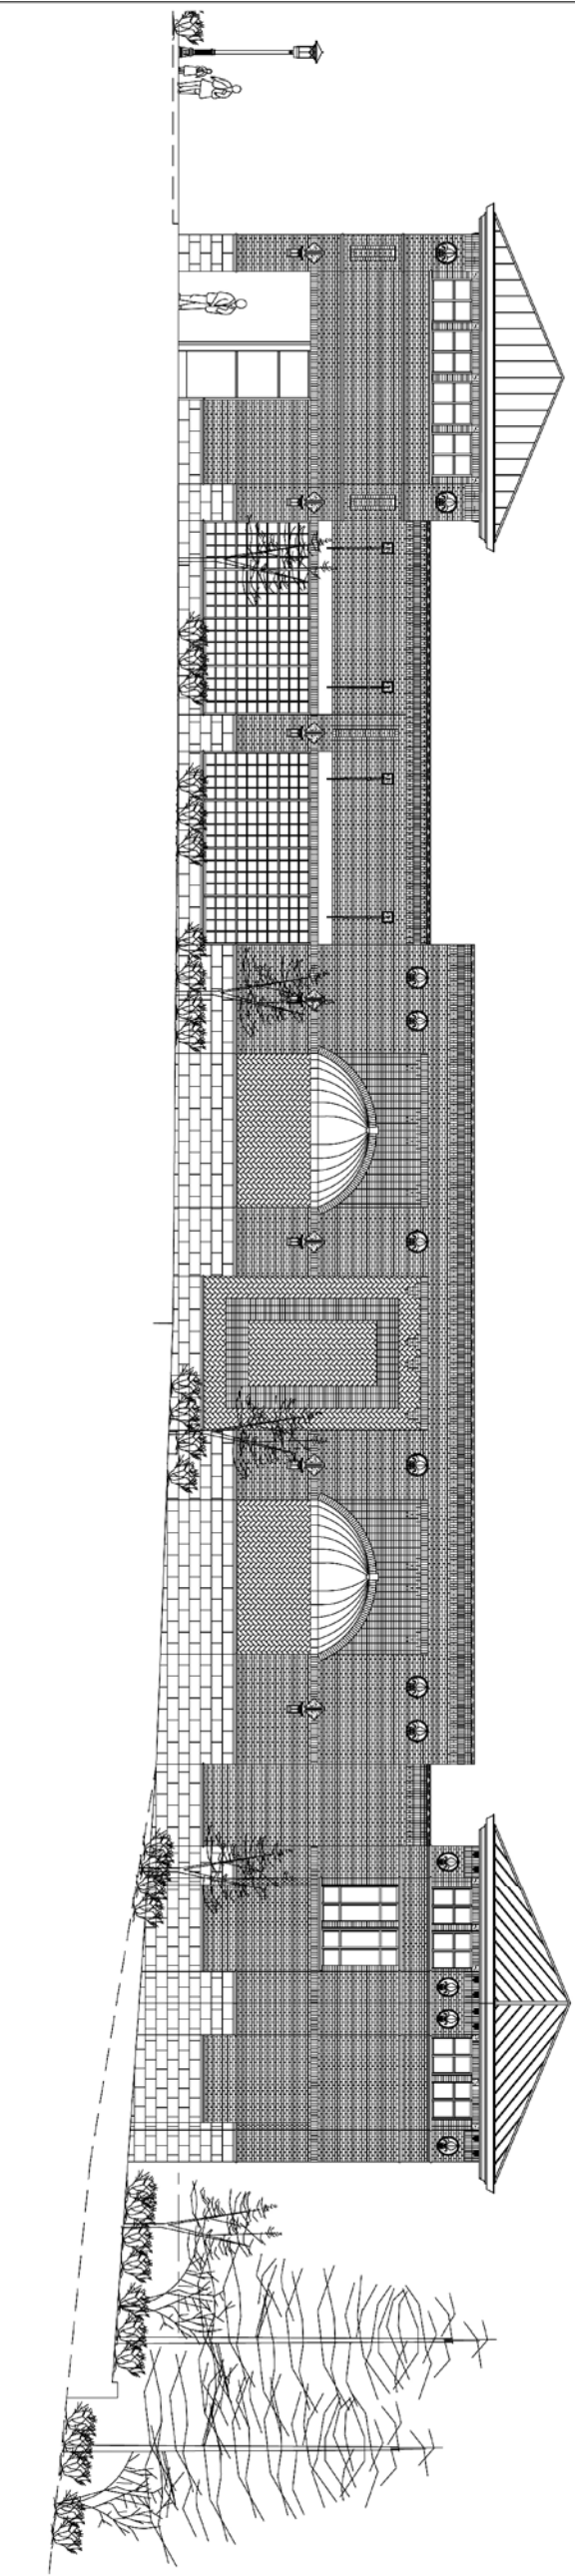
EXHIBIT A: W.T. HARRIS BOULEVARD ILLUSTRATIVE BUILDING ARCHITECTURAL ELEVATION
